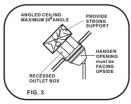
, 2 and 3 are examples of different ways to mount the outlet box.
